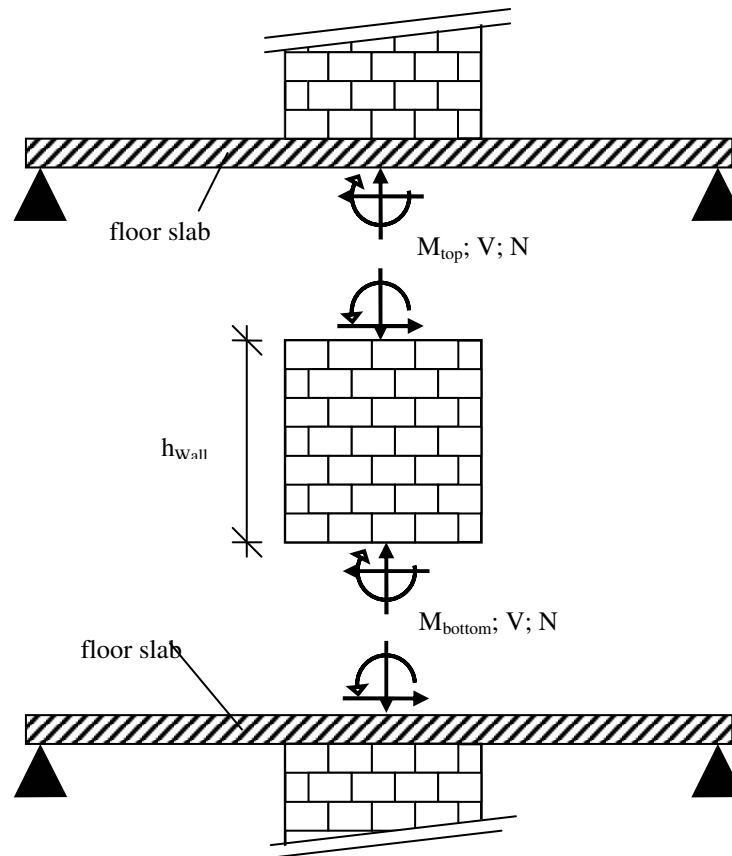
Shear wall in a multi-storey structure with loads acting at the top and the bottom of the wall
